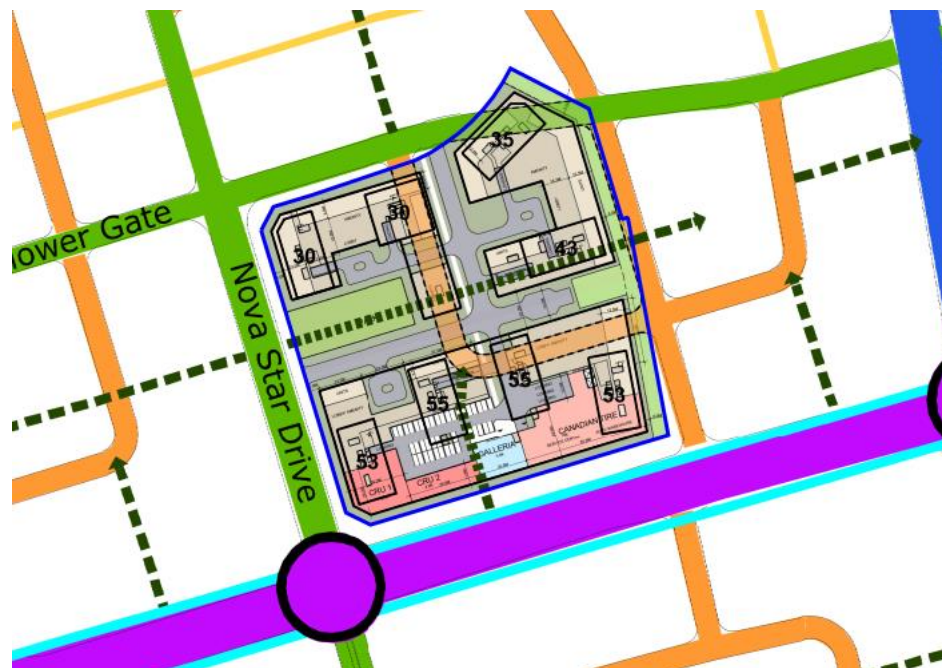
Site Plan Overlay on Weston 7 Secondary Plan Schedule 4 – Transportation System
